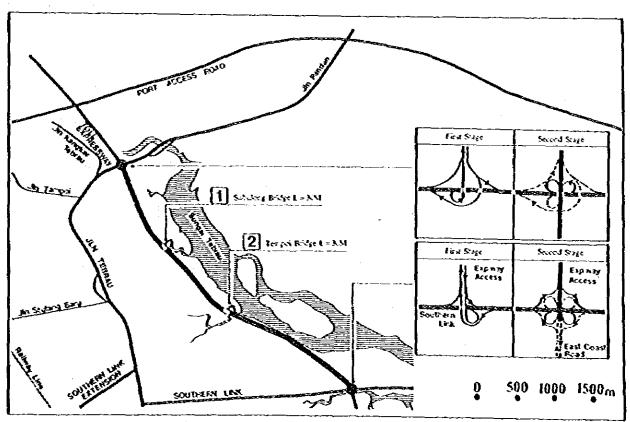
TOLL EXPRESSWAY ACCESS: BRIDGE LOCATION FIG. 4-46 INTERSECTION/INTERCHANGE RECOMMENDED PLAN
